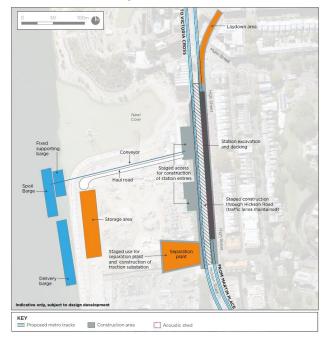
Potential barging arrangements at the Barangaroo site (extracted from the SPIR)
